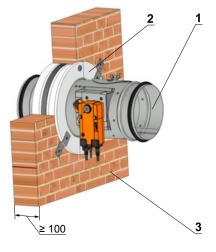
Solid wall construction - installation frames E1, E2, E4, R1, R2, R3, R4, R5
